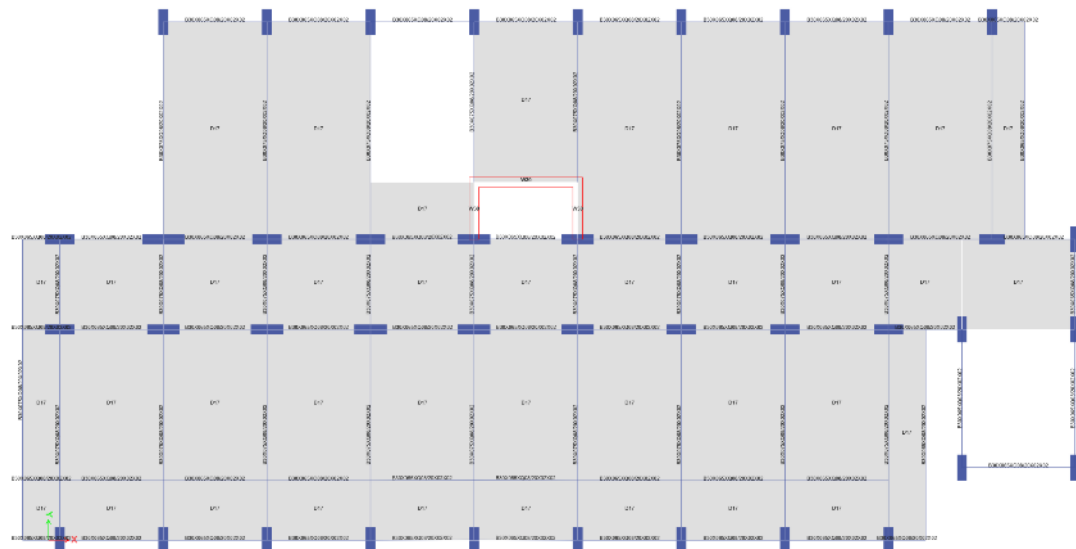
Formwork plan and element sections for the Ground and the 1st Floor.
